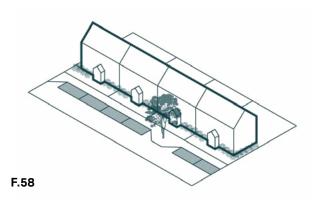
Illustrative diagram showing an indicative layout of on-street parking
